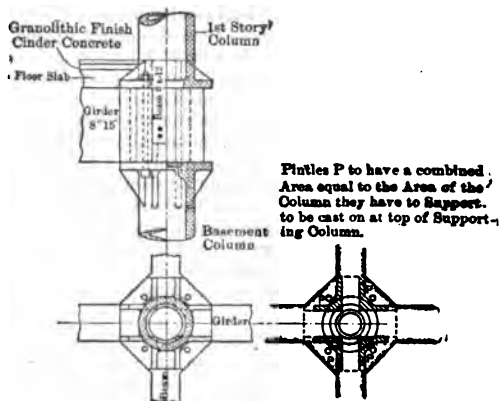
Connections for Cast-iron Columns and Reinforced-concrete Construction.
